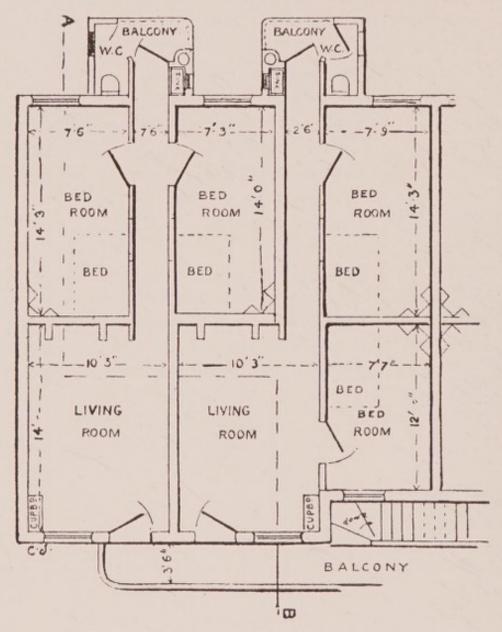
LIVERPOOL CLINKER COTTAGES. Plan.
